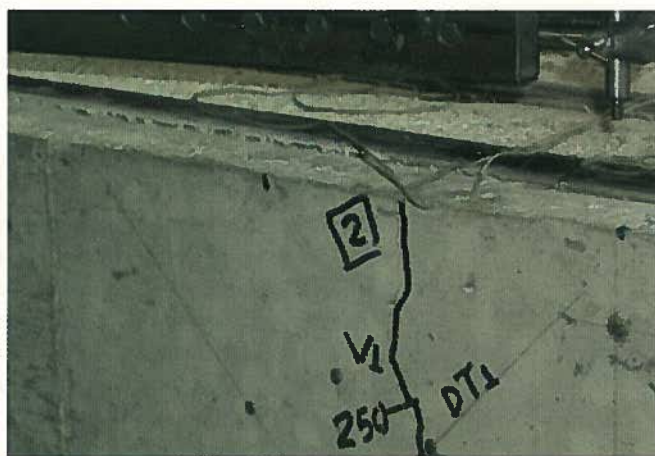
Initial cracking in concrete substrate of Specimen C3 at 90 kips (400 kN).
